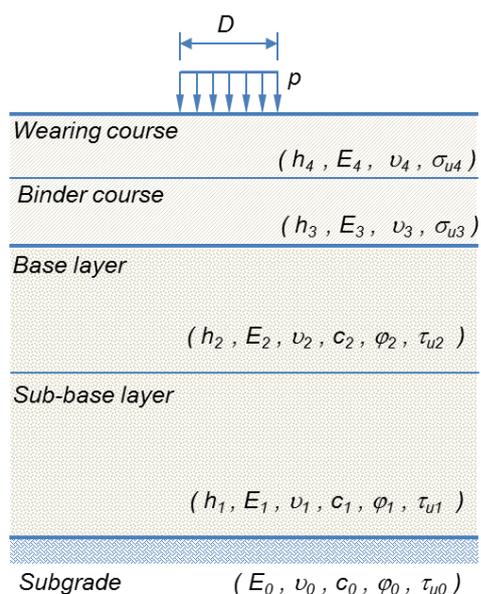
Illustration of one proposed pavement structure including relevant data and information
